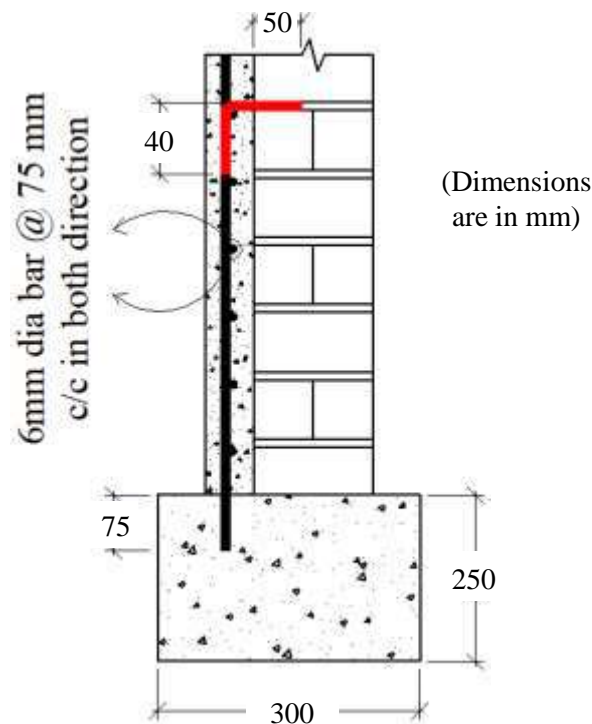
Schematic detailing of reinforcement and its anchoring
